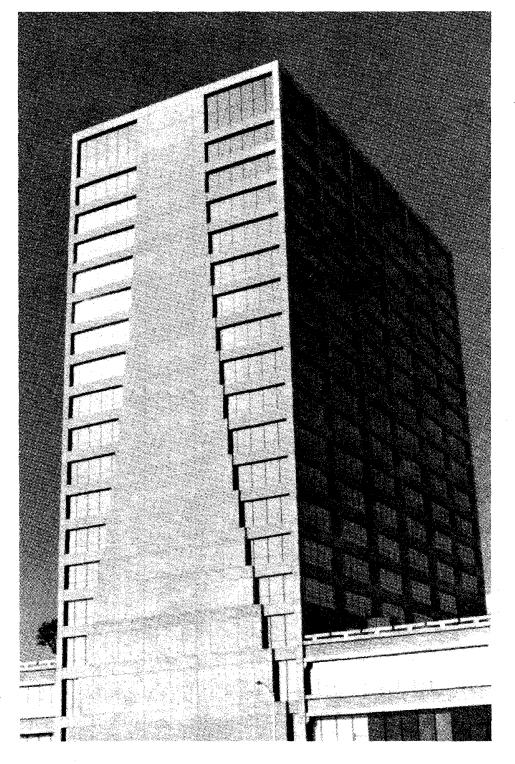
Shear wall diminishes with height. Tandy Center building, Fort Worth, Texas. The lateral forceswhether wind loads or seismic-which must be transmitted by a shear wall, increase towards the building base. This simple and economical office building is a rare example of shear wall design that reflects this: the design also increases the available window area. Growald Architects.
